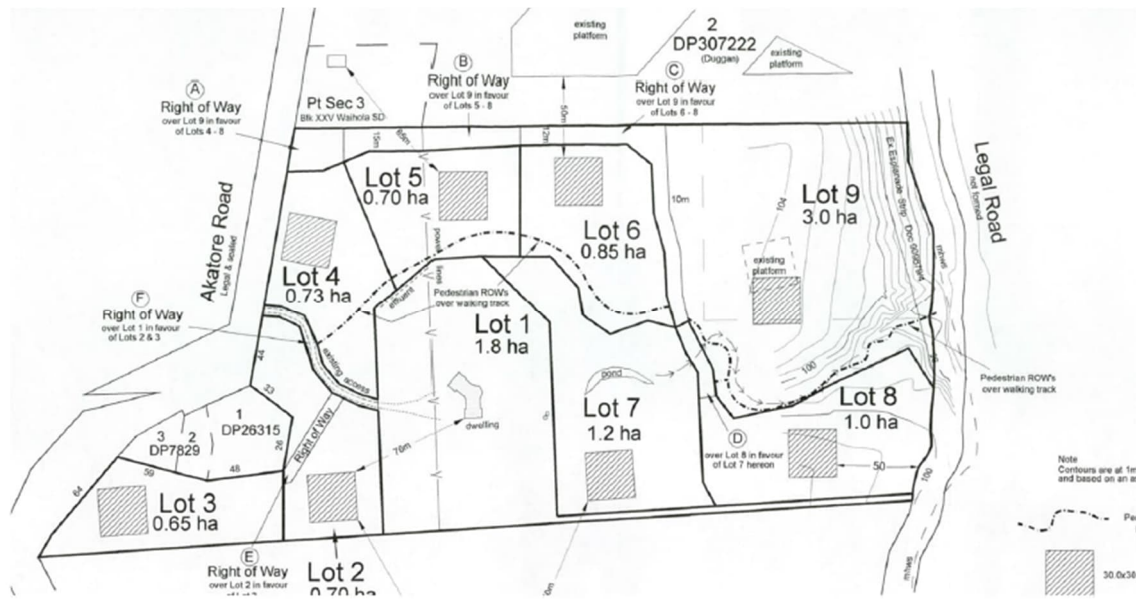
Site Plan from the previous subdivision RM1411 which created 8 residential allotments and the ROW used to access the site.
